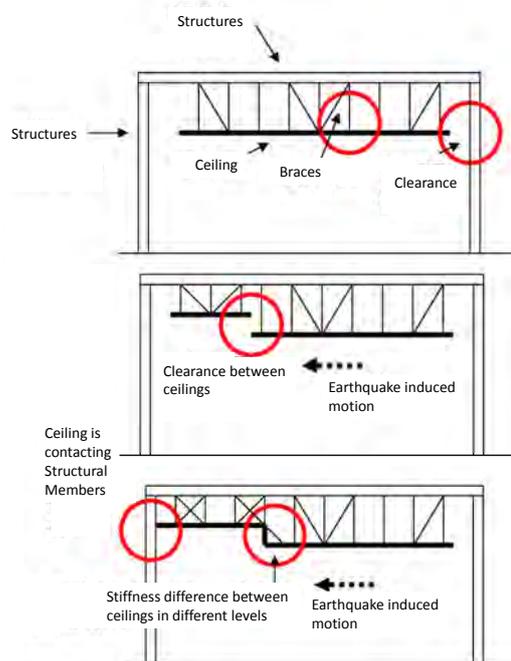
Schematic Explanation of Technical Advice on Details of Ceilings
